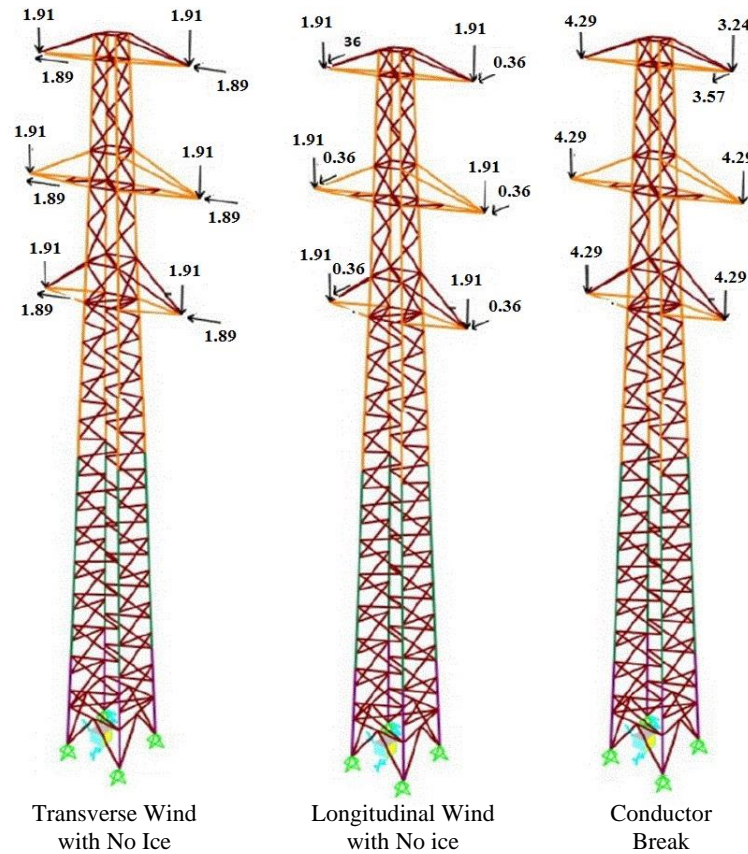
Loading cases and calculated loads (kN) on tower No.112 (RU-4 type tower)
